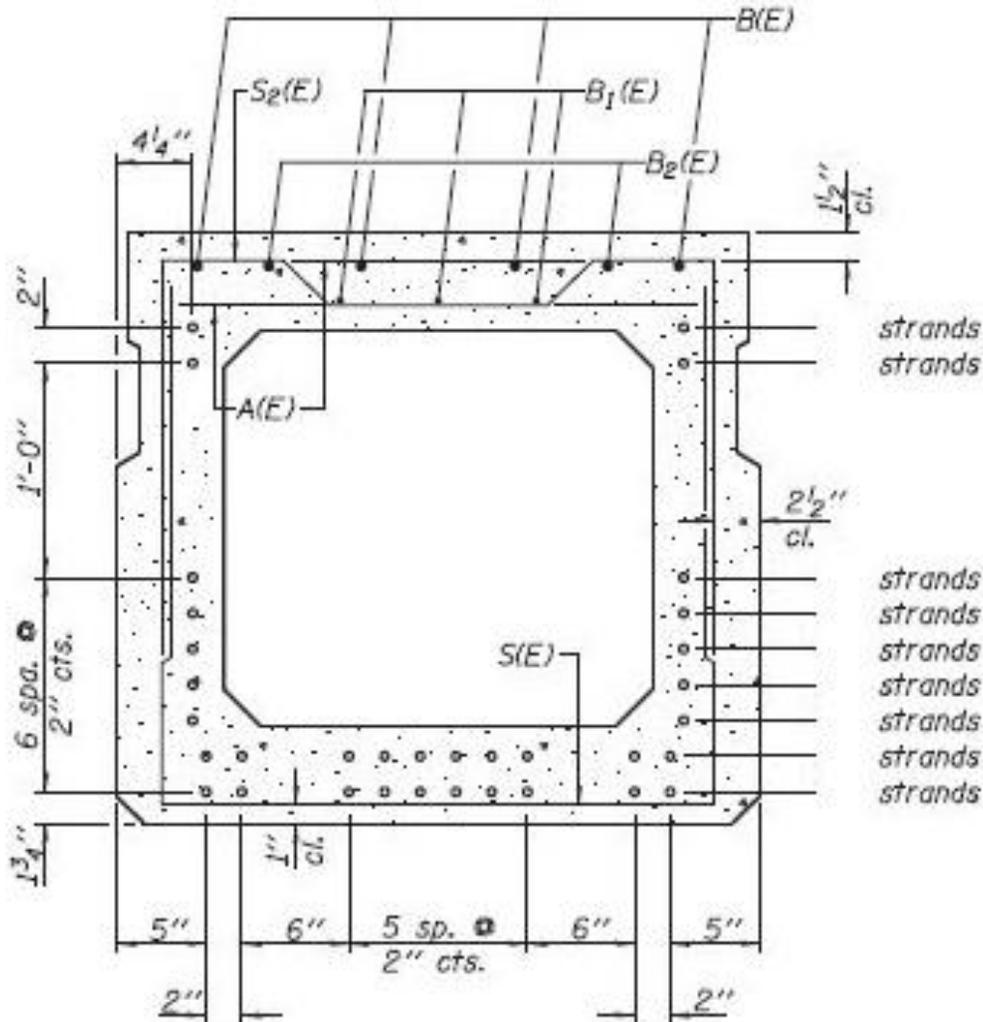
Typical Illinois Precast, Prestressed Box-Beam Girder Details [2]
